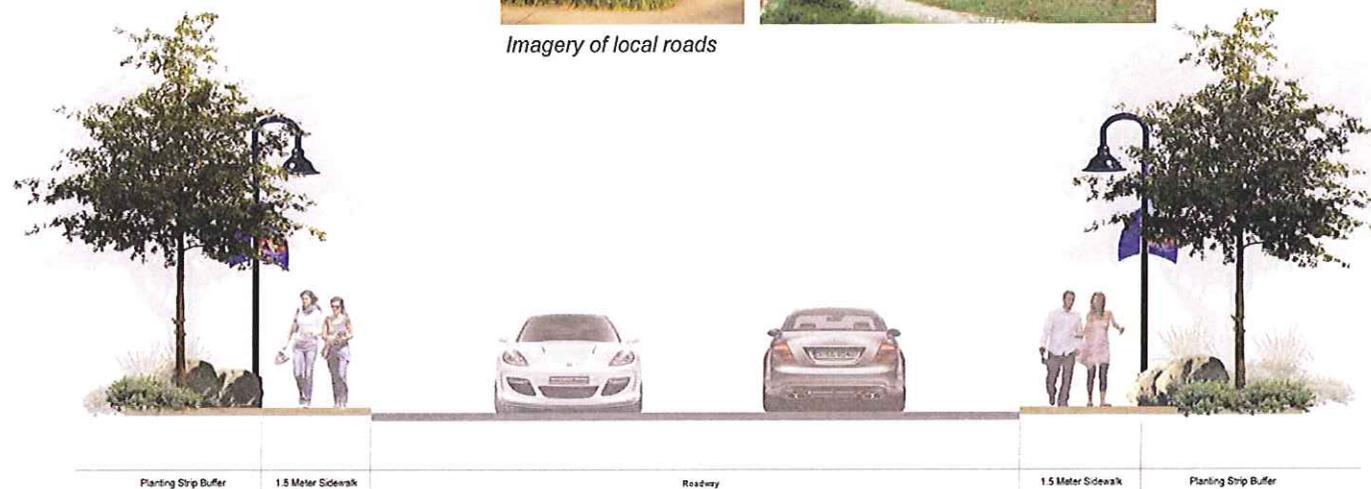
Schematic Cross Section—Roads Outside of Core Area
